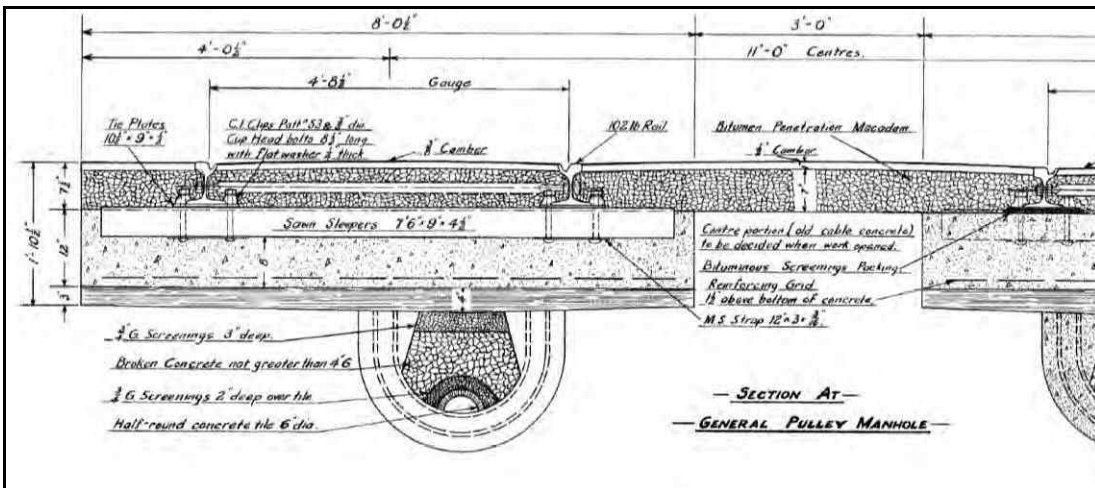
MMTB plan, 1941, reconstruction St Kilda Road between Park Street and St Kilda Road Junction (PTV P9032_049C).
